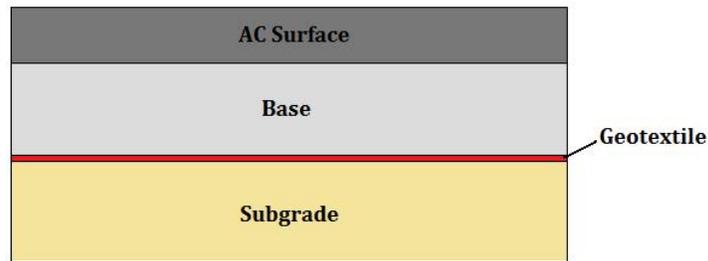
Typical section with geotextile used in Pavement Structural Section applications
